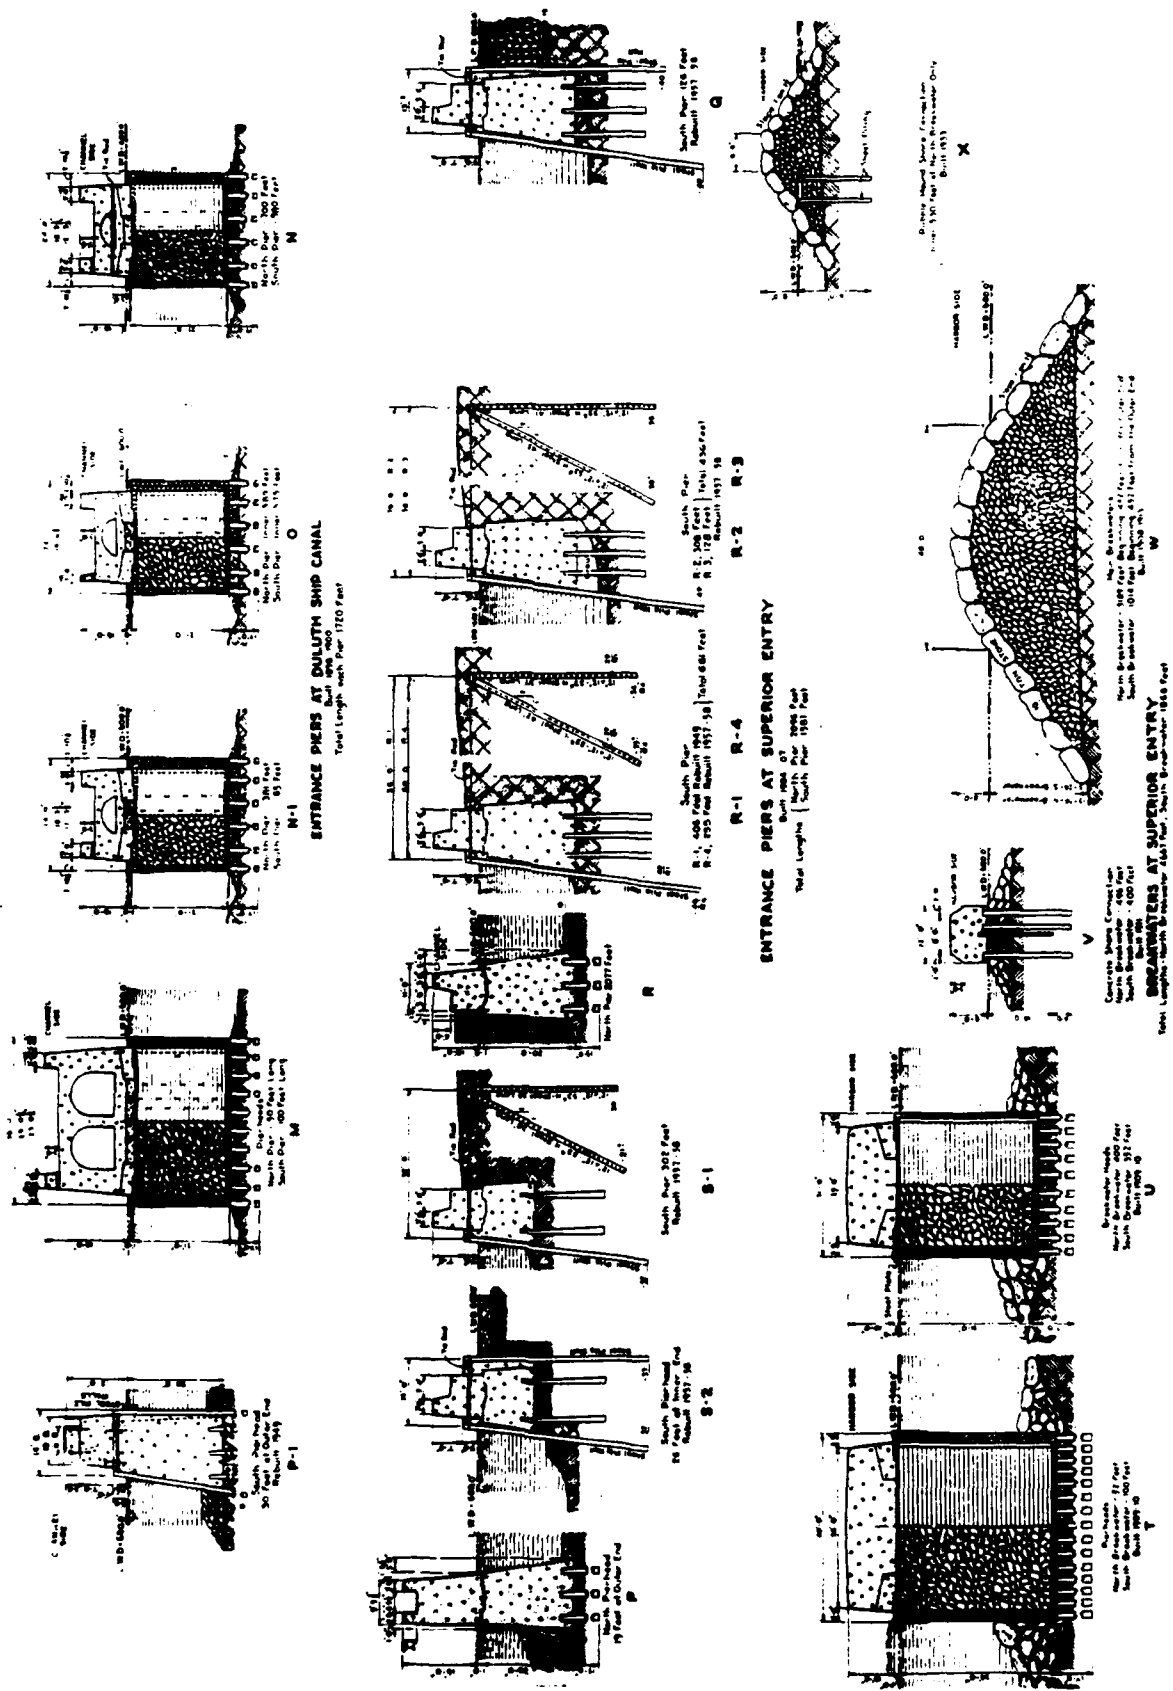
Typical pier cross sections, Duluth-Superior, Minnesota and Wisconsin
